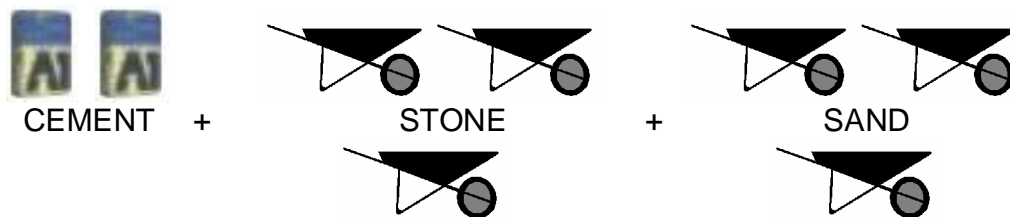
RECOMMENDED FLOOR SLAB CONCRETE MIX
